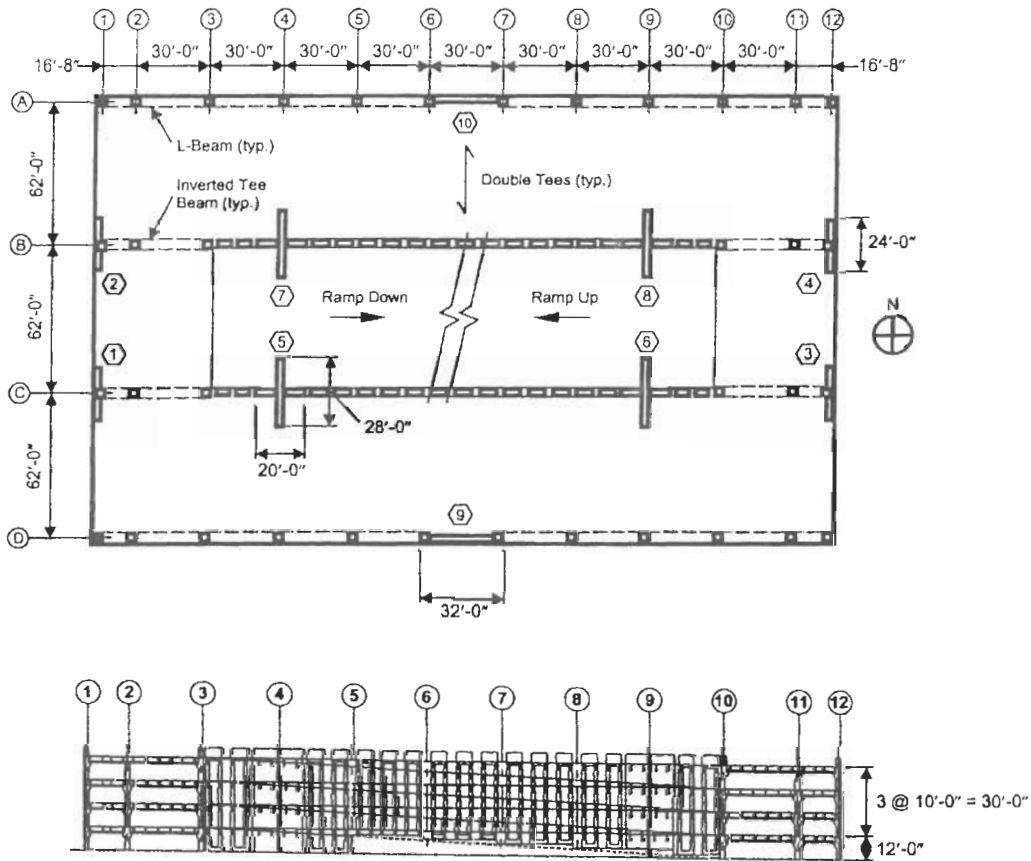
Typical Plan and Elevation of Precast Parking Structure (SDC B)
